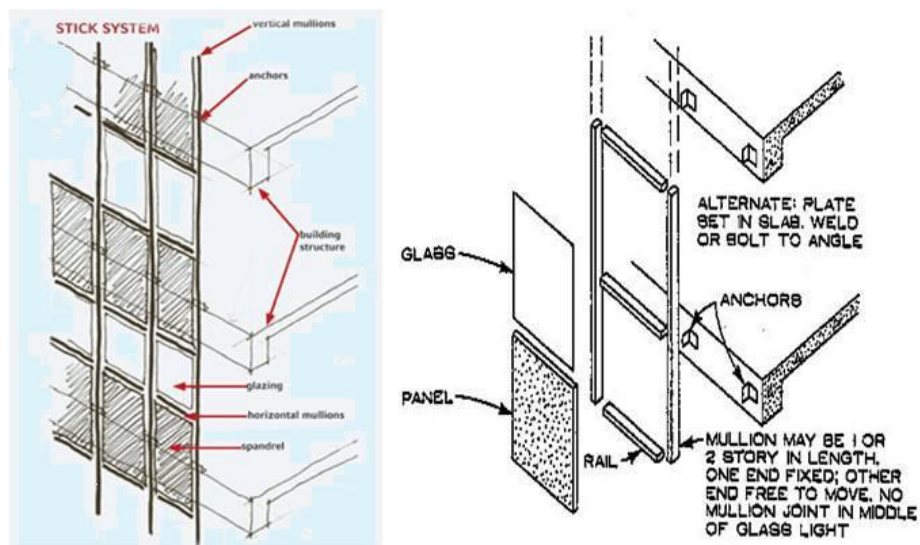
Typical Stick System Curtain Wall Installation Technique (Helmut, K. 2008) and (Wong Wan Sie, W. 2007)
